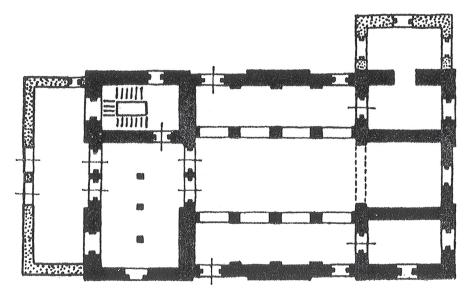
Church of Däbrä Dammo, Təgray, floor plan; after Deutsche Aksum Expedition
